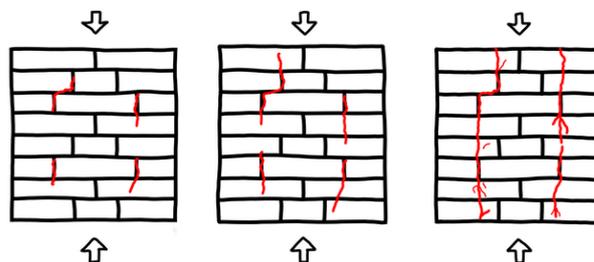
Typical crack pattern of a compressed masonry wall
